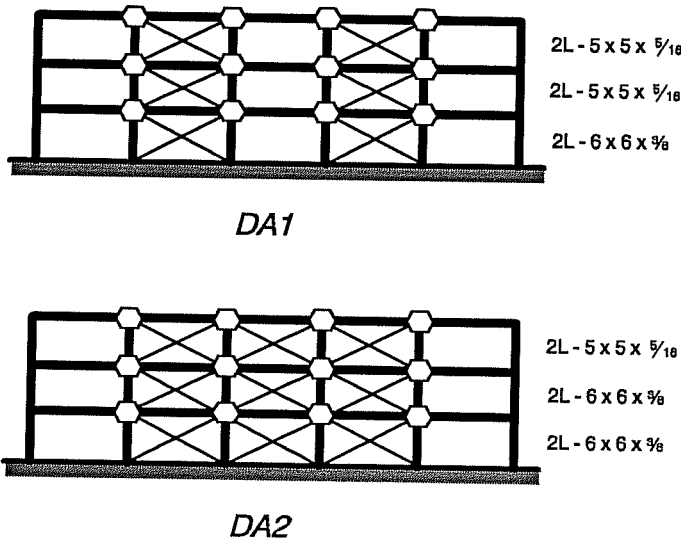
Bracing configurations for concentrically braced building with structural steel braces (perimeter frames only).
